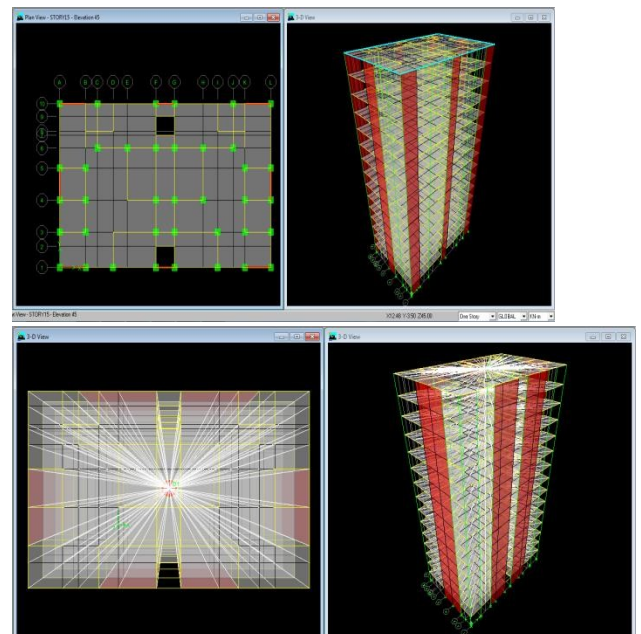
Building with 28% Shear wall opening Fig 2.4
